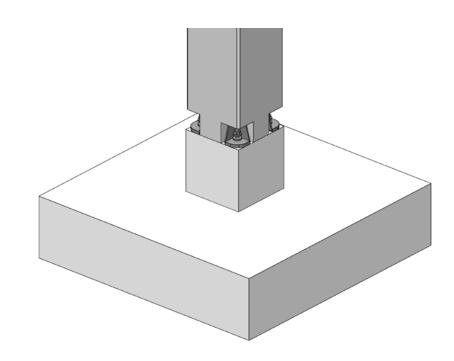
Prefabricated foundation with bolted connection - Own illustration
